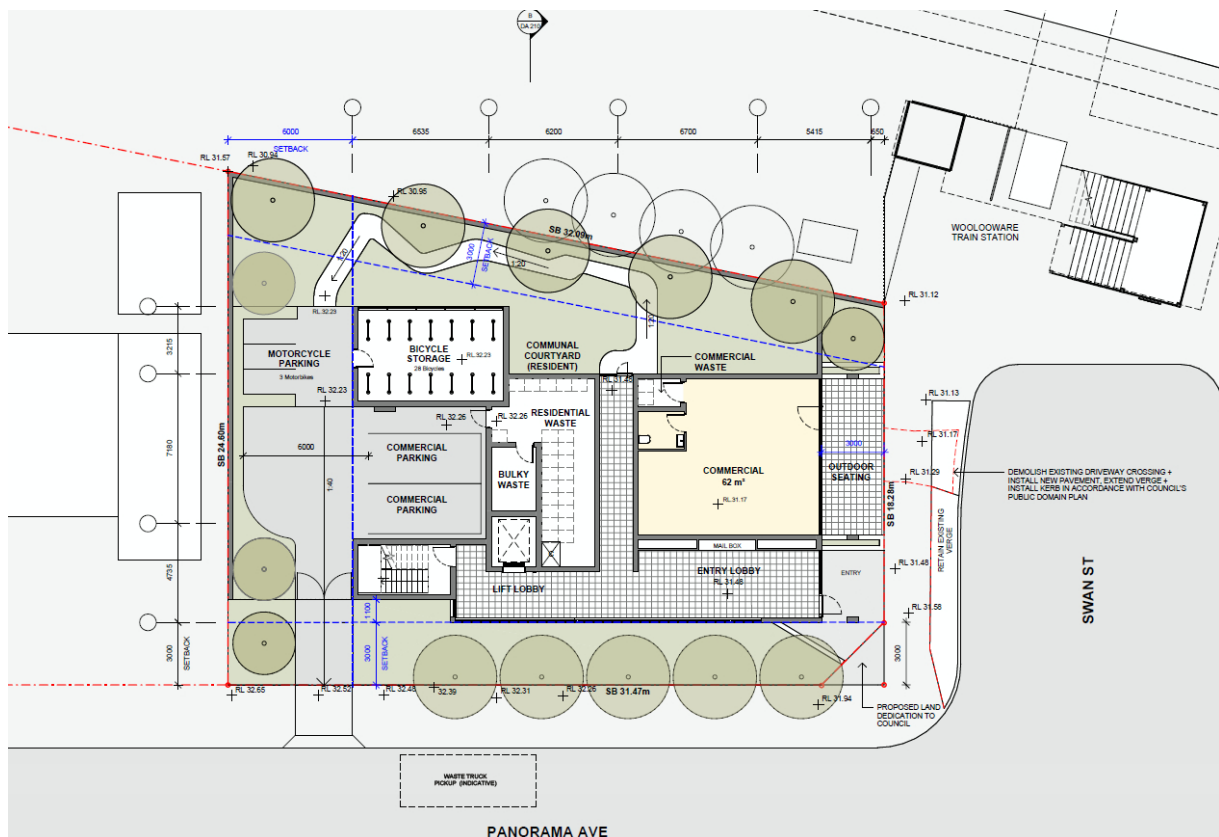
Proposed ground floor plan for the site (source: Stanisic architects, 2025)
